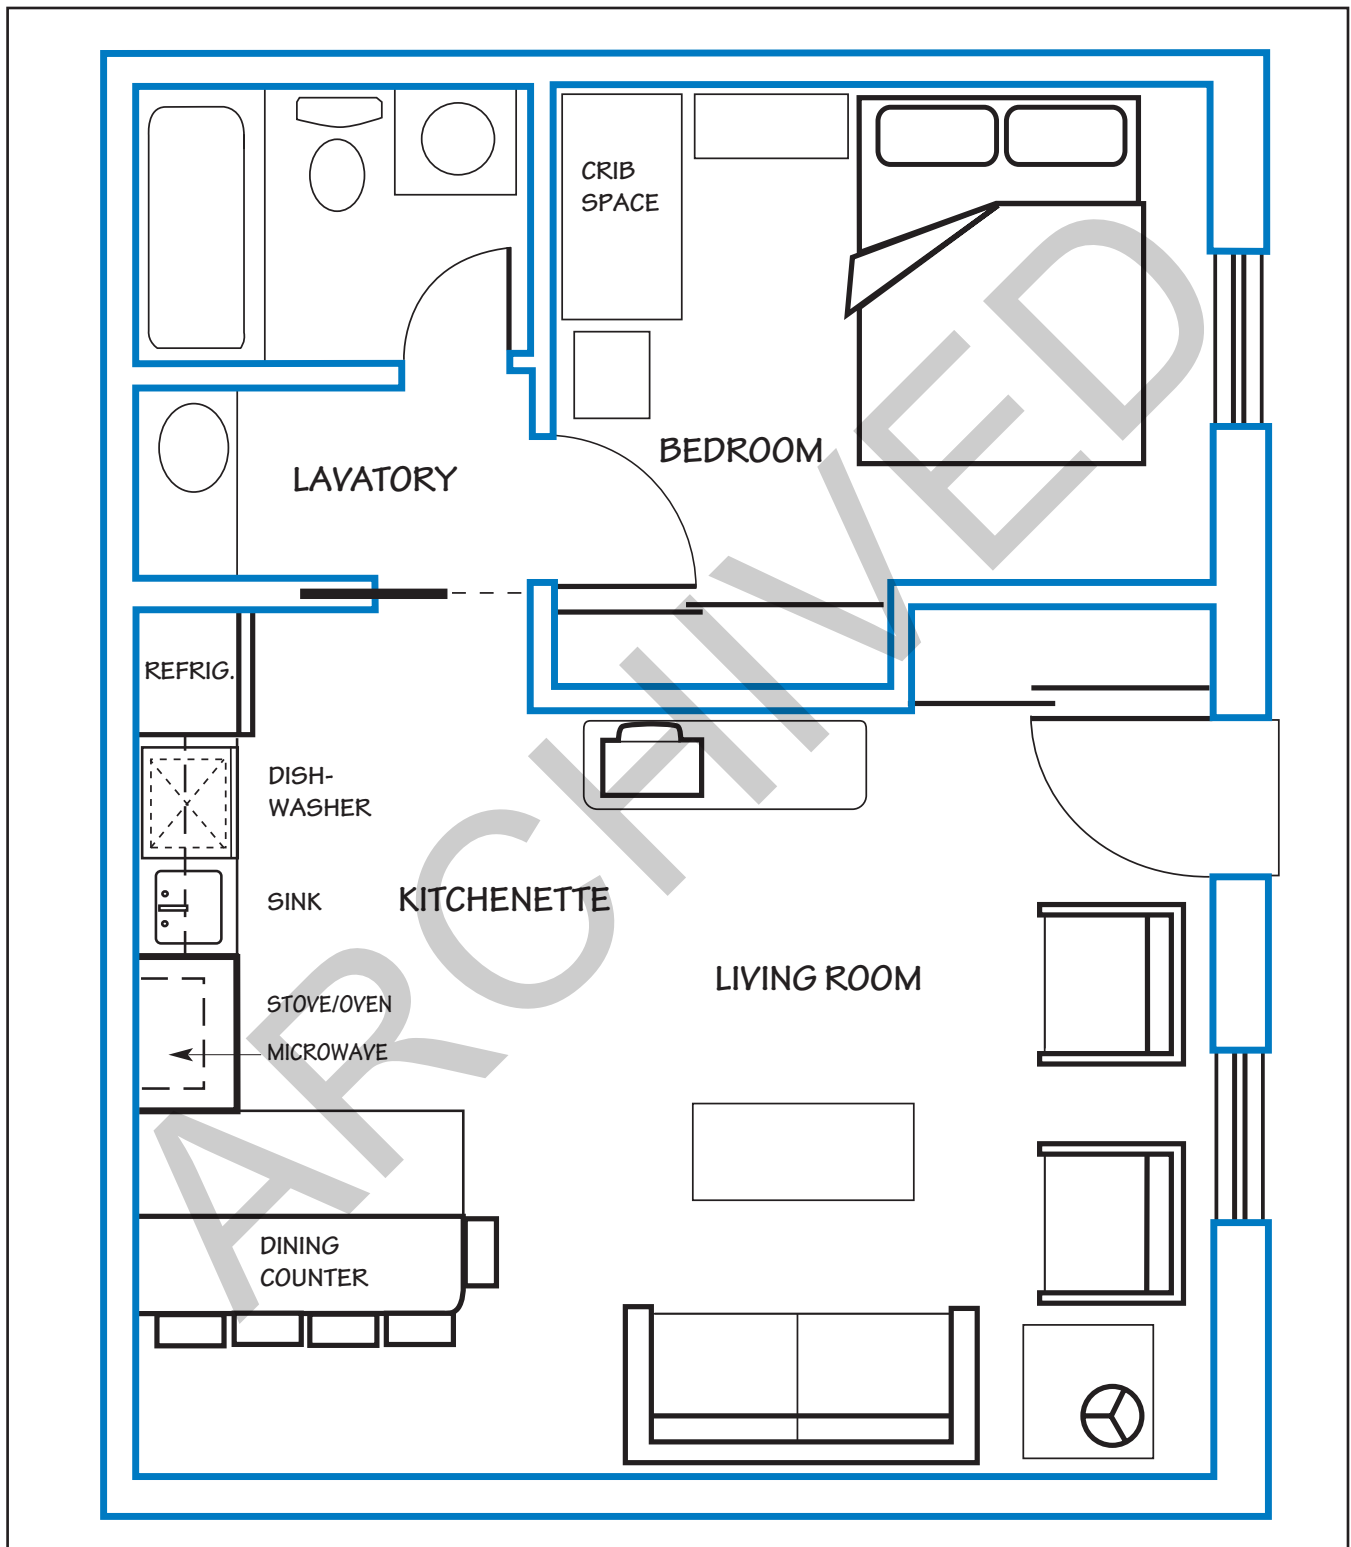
B: Concept Floor Plan for the Temporary Lodging Facility.
